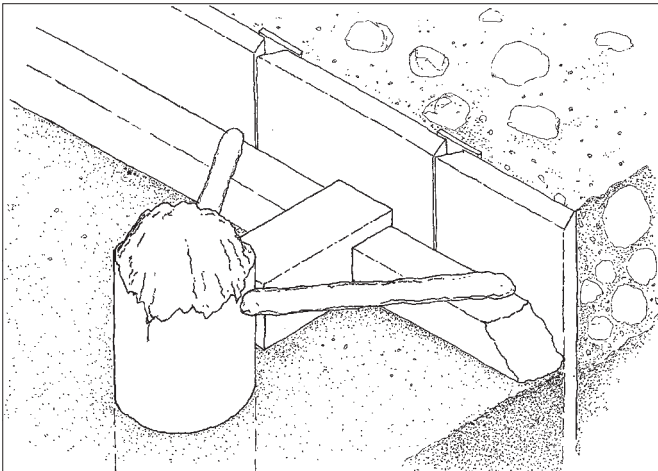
Detail of the fixing bracket securing the lower rail to a stipes on the formwork on the side of a concrete quay to the south of Punta Pennata at Misenum (C. J. Brandon after Benini and Lanteri 2010: 114–15).
